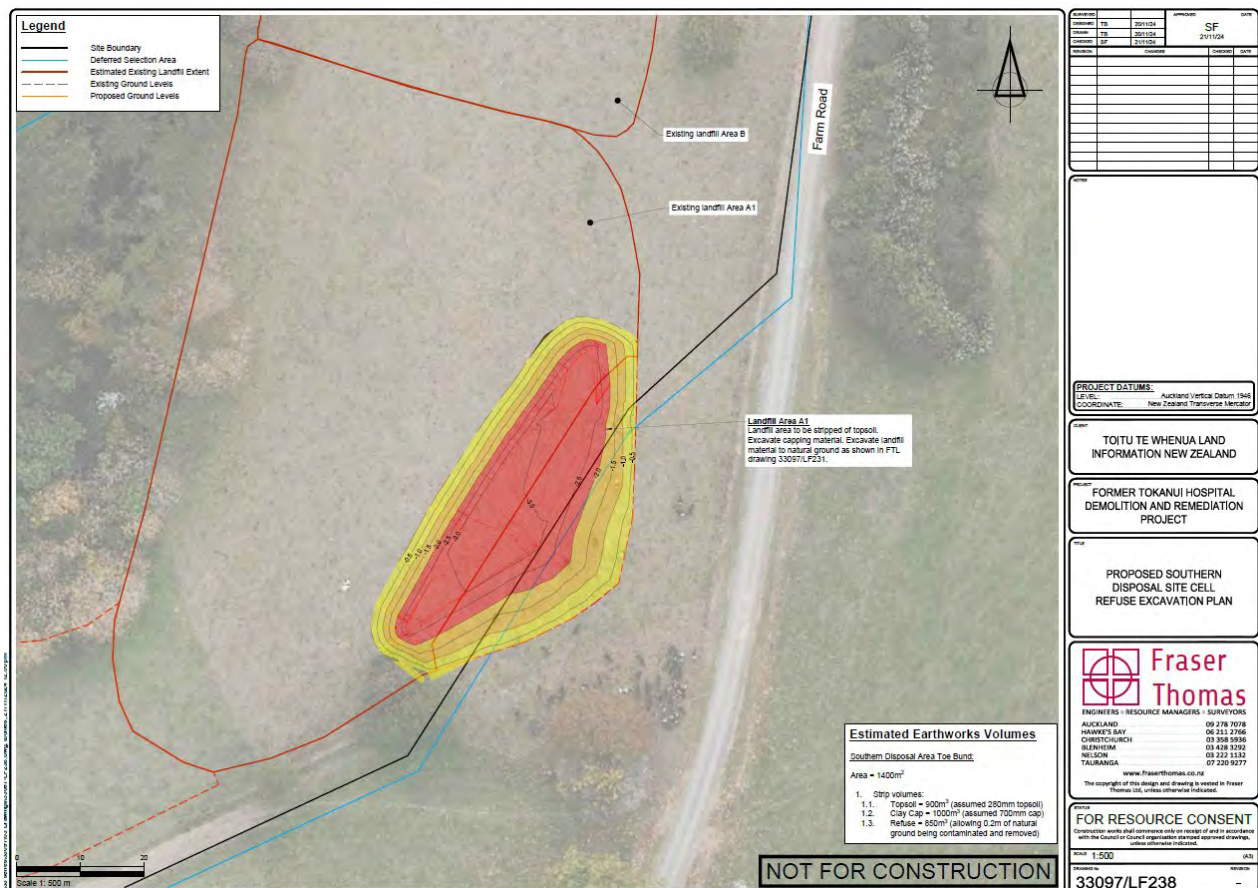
Proposed Southern Disposal Site Cell – Refuse Excavation Plan
